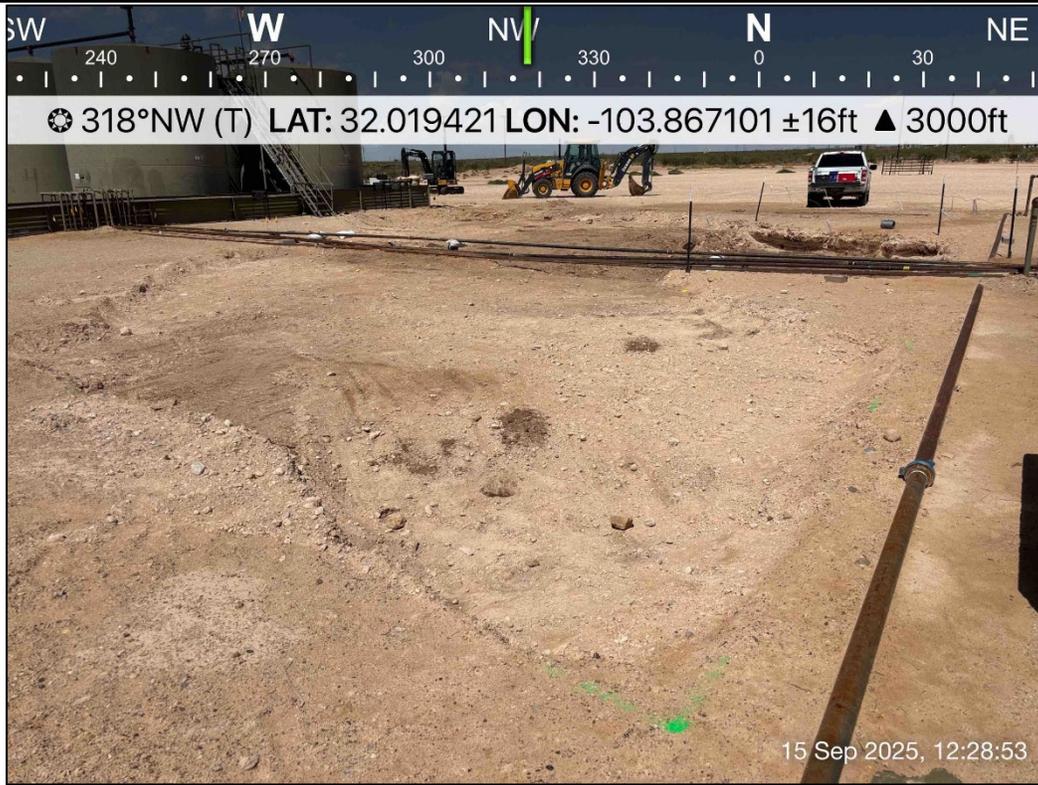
Northwestern view of the excavation extent. 09/15/2025
